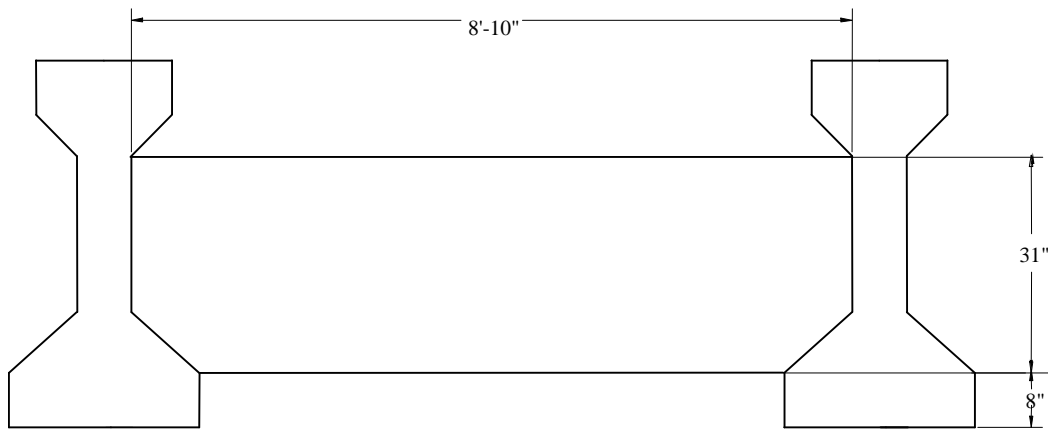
Interior Diaphragm Spanning Between Girders - Nolanville Bridge
